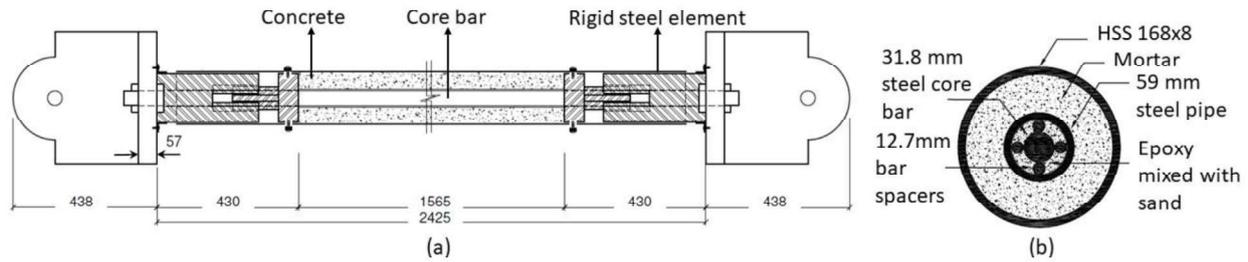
BRB brace: (a) Side view; and (b) cross-section of BRB (Al-Sadoon, 2016)
